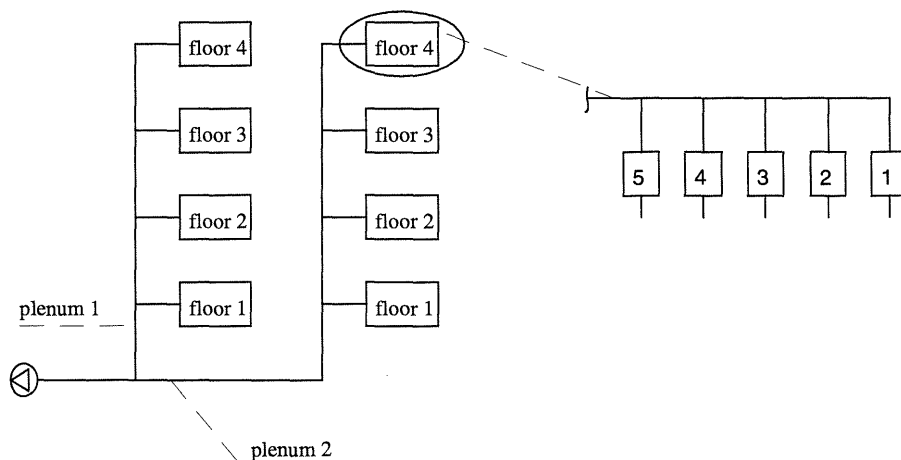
Layout of exhaust ventilation system for four floors and ten rooms on each floor.
